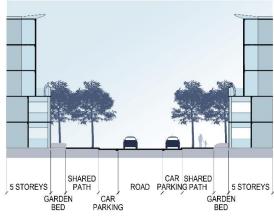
Hargreaves Street Plan Extract and Indicative Cross-Section
